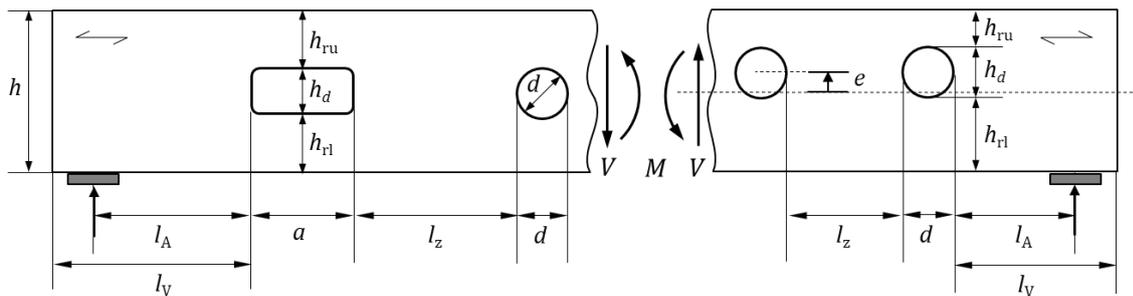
Dimensions of holes in the ribs of a best wood CLT BOX
